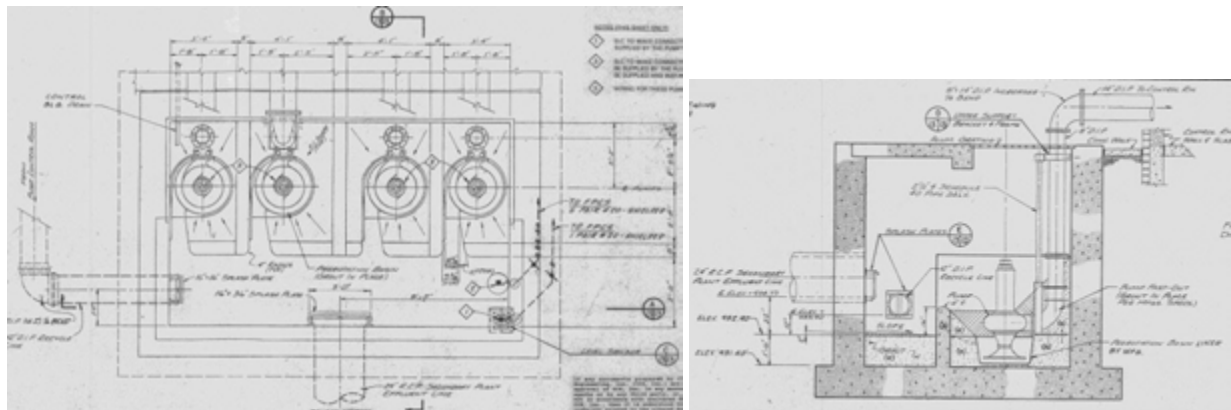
Intermediate Pump Station – Plan and Typical Section (WVP 1992)
